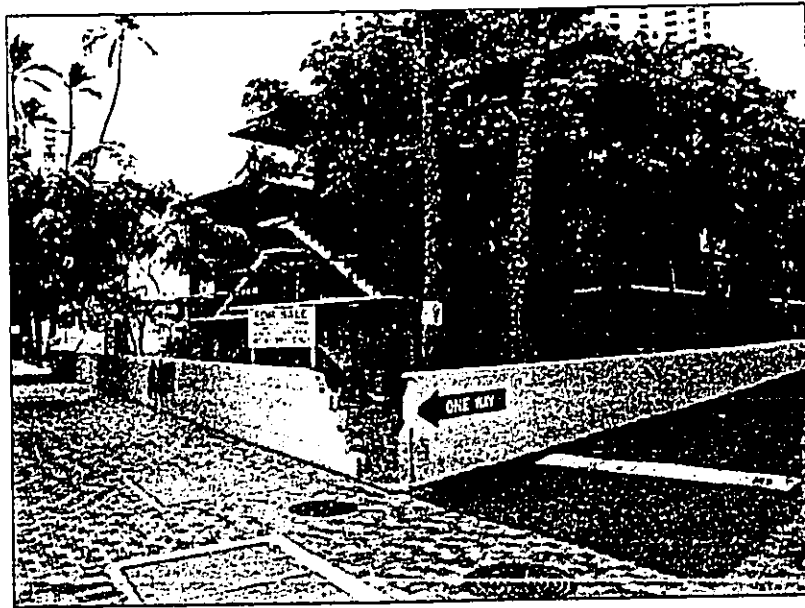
Project area from north corner on Kalākaua Avenue showing unoccupied apartment buildings and Wave nightclub building in background; view to south
